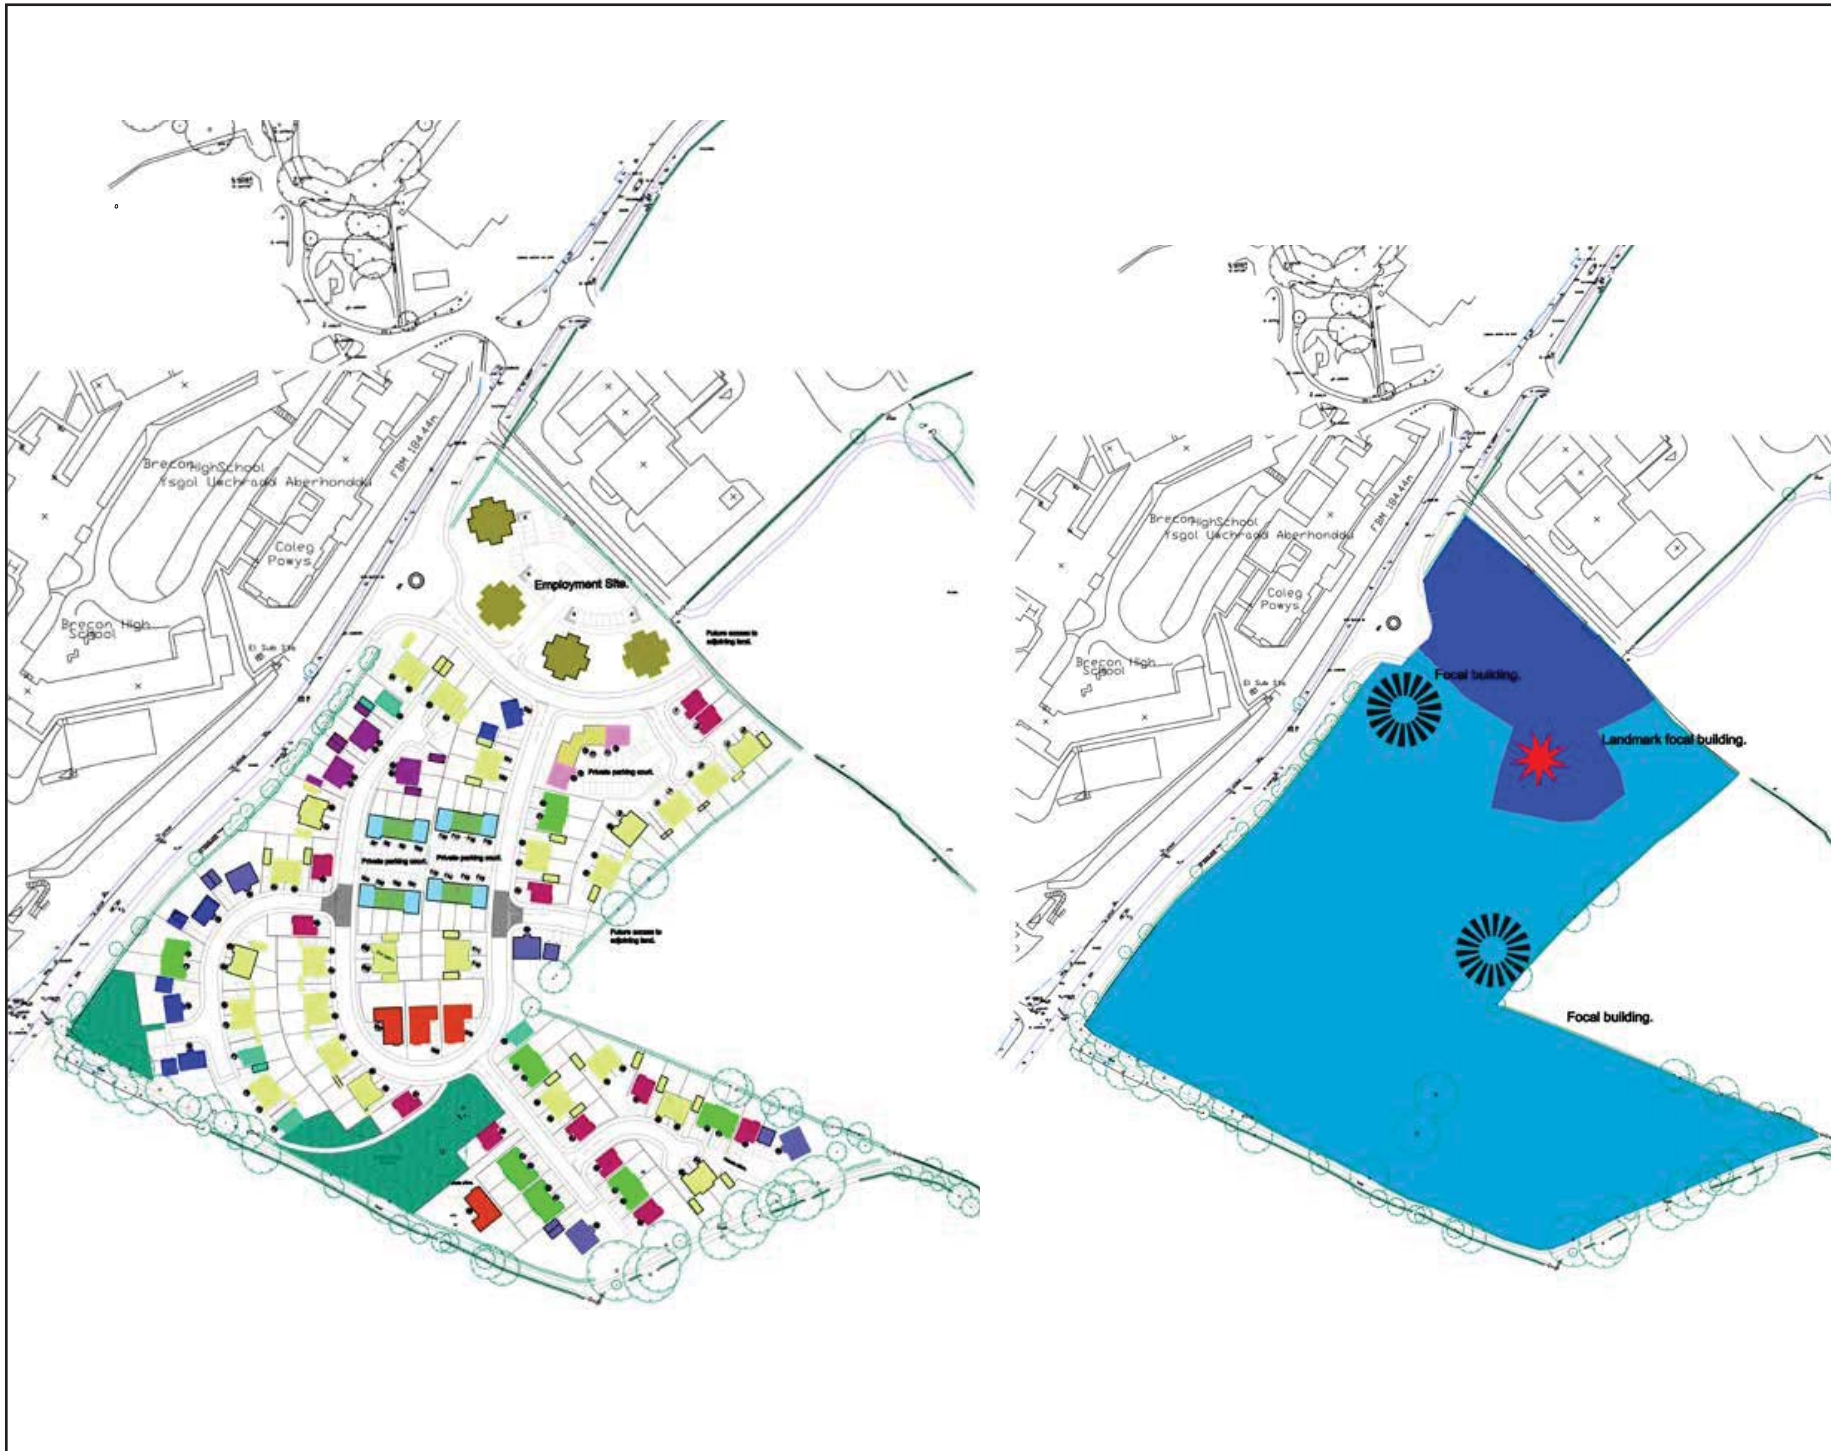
Outline proposed site development plans, showing a proposed layout of buildings and open spaces on the left, and building heights on the right.
